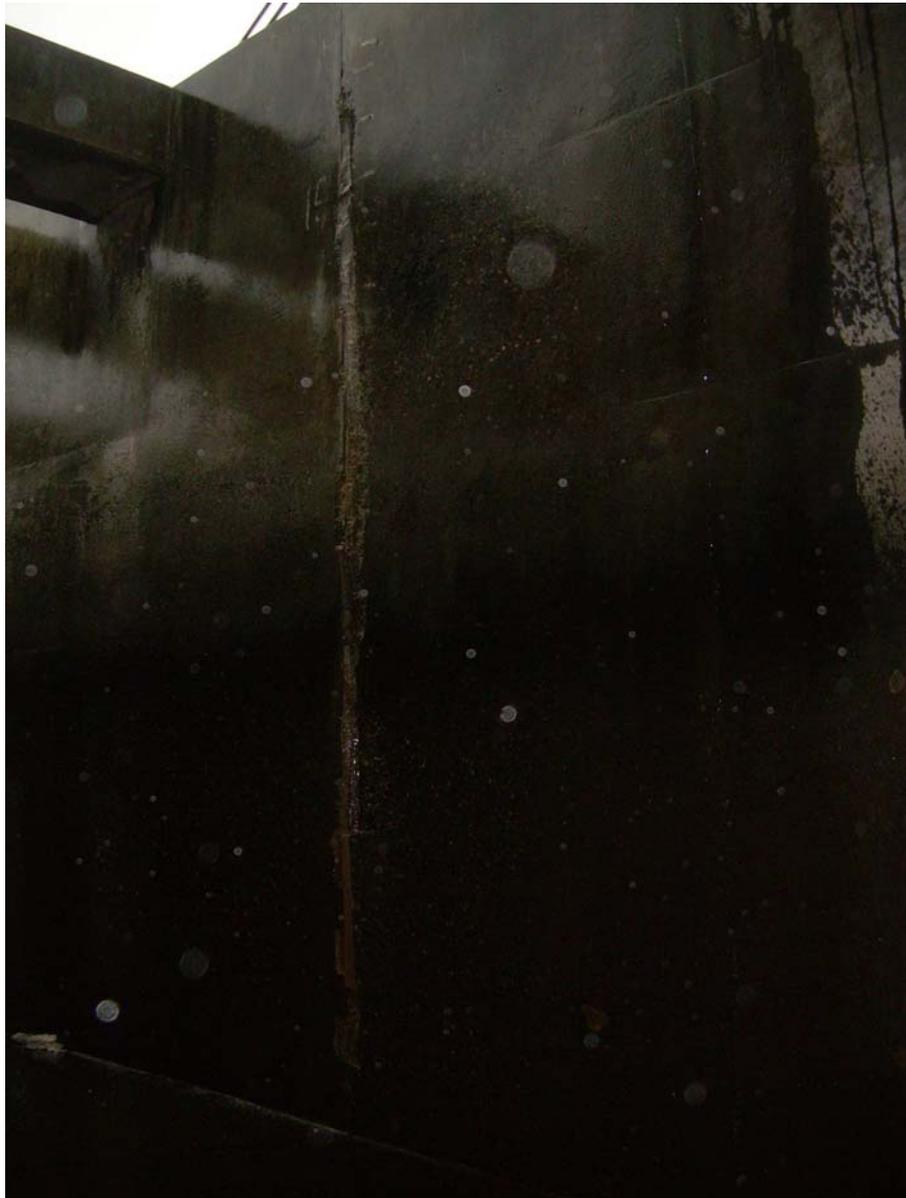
Sta 25+46 left side channel spall repair 28" high by 8" wide max. Spall is not adhered to concrete
